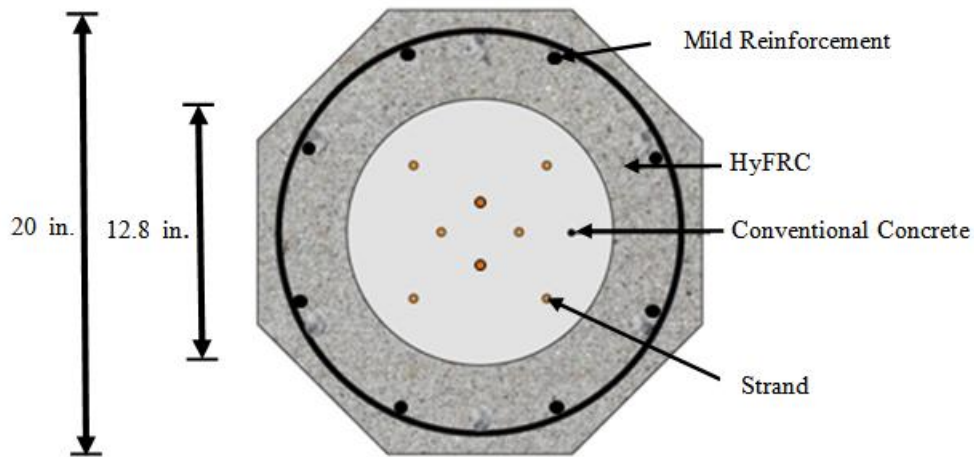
Schematic cross section of PreT-SF-FIB plastic hinge region (Finnsson et al. 2013)
